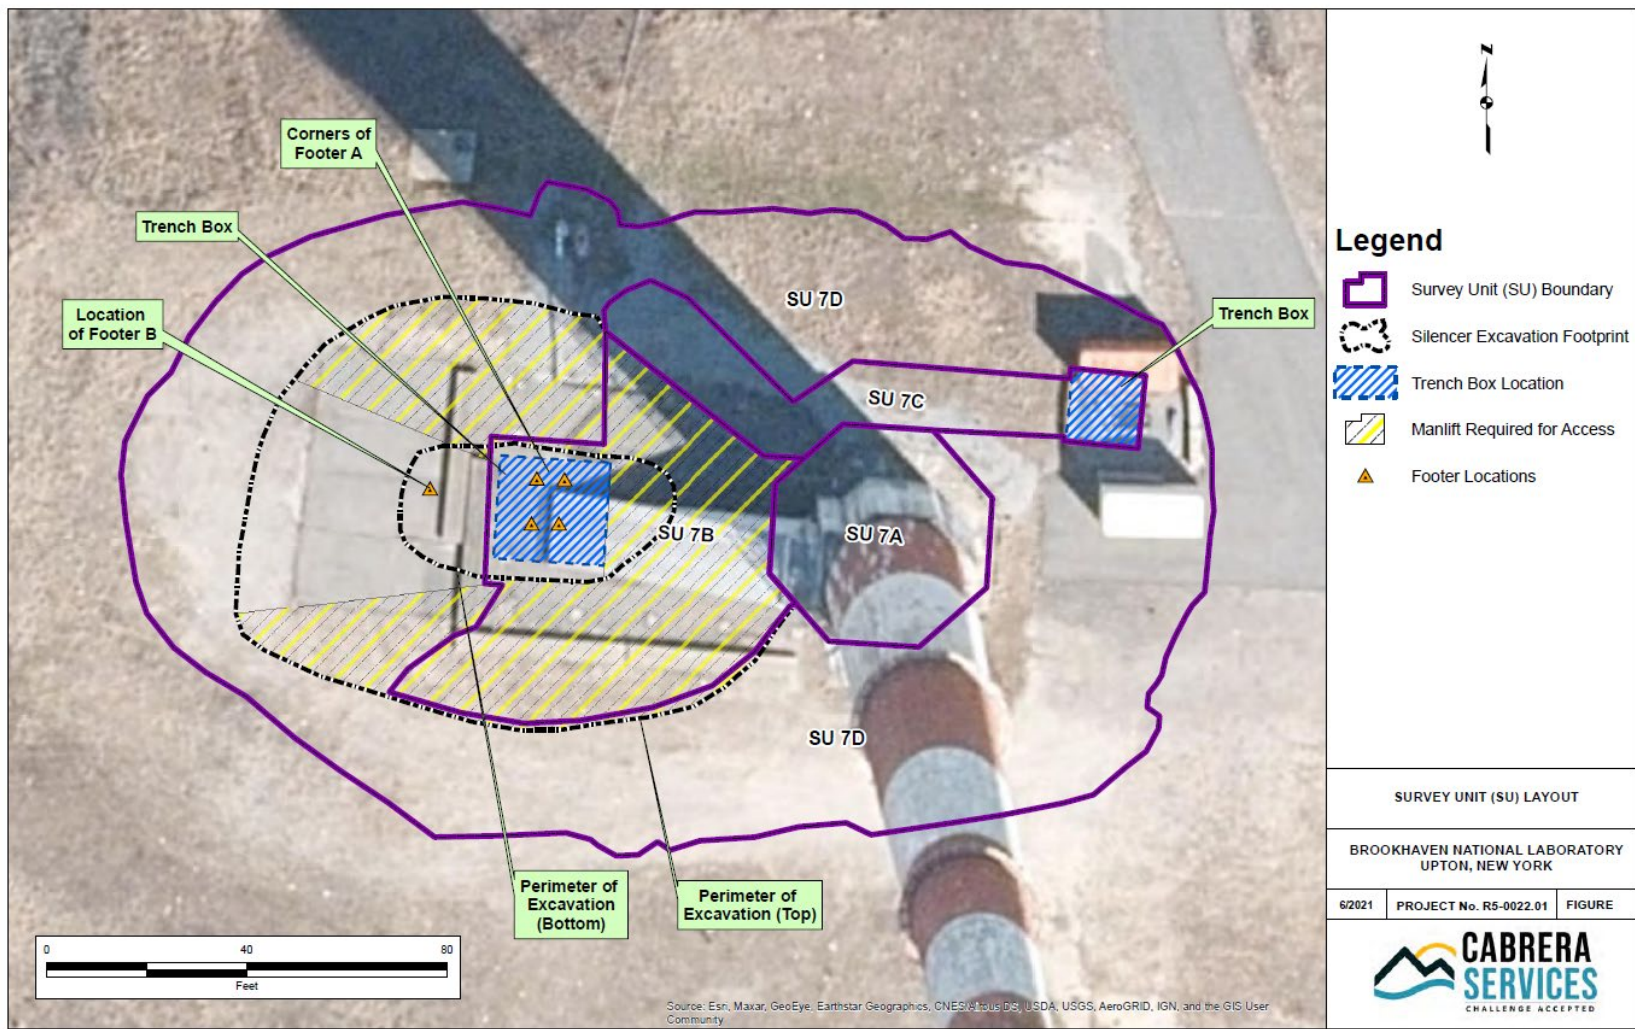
Survey Unit Layout for the HFBR Stack Demolition (OFJV 2021)
